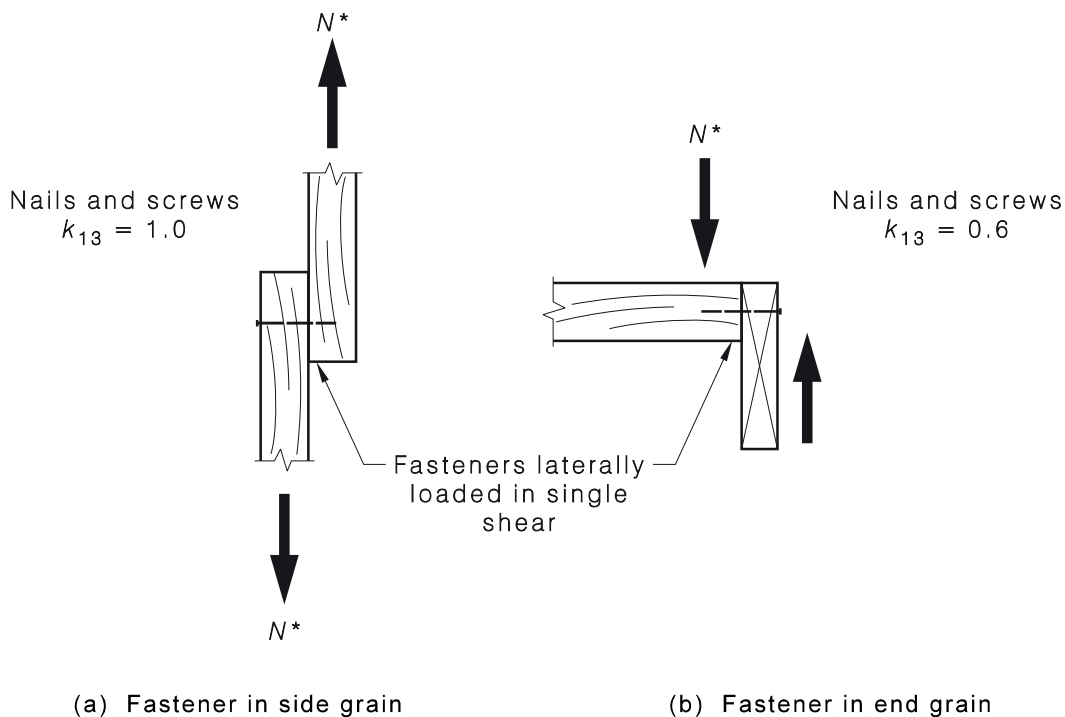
TYPE 1 JOINTS FOR NAILS AND SCREWS LOADED IN SHEAR
